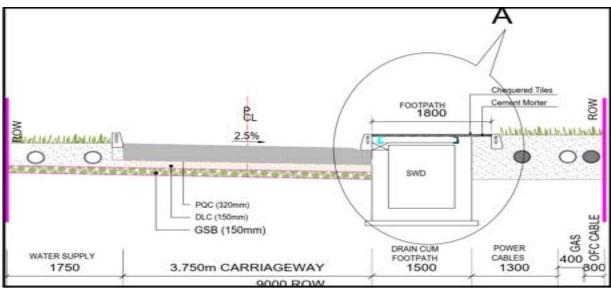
Typical Section of Road Network as per Master Plan Development
